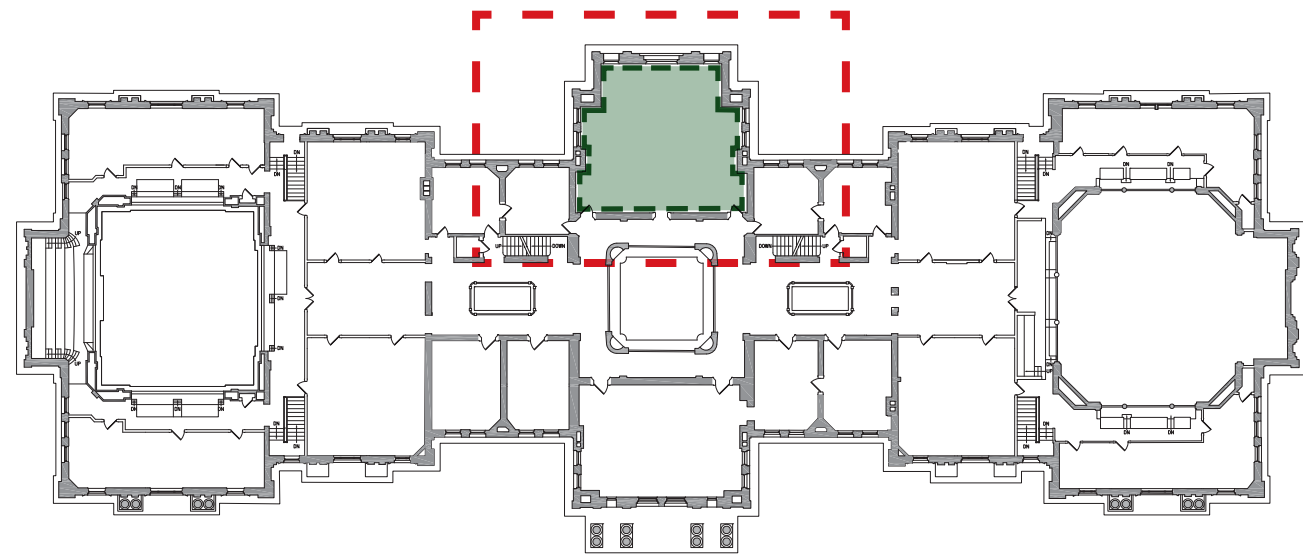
Third Floor Level Selective Removals Plan.
